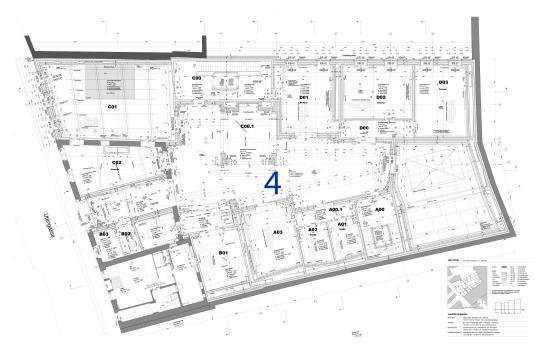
The architectural plan of the building, floor 0. 4: BREATHING WALLS.
